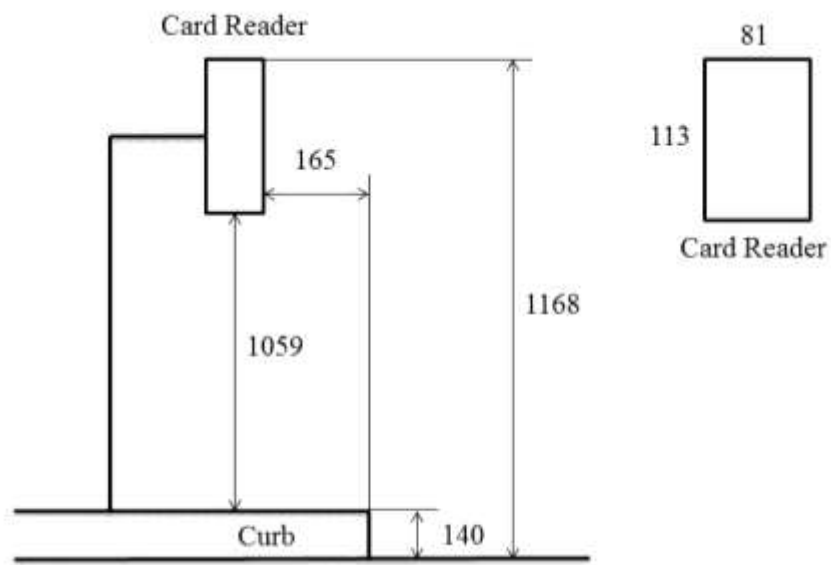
Dimensions (in mm) of the old card reader at the entrance to the staff parking lot.
